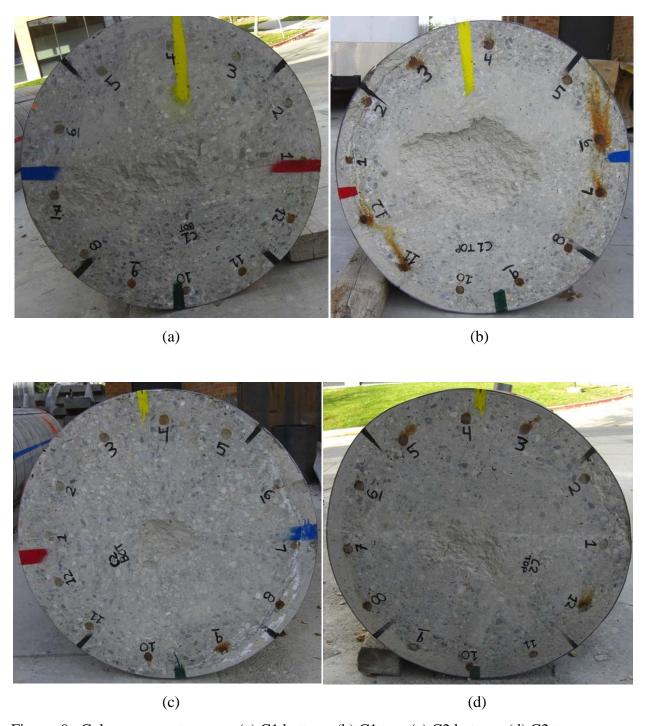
Column concrete cover: (a) C1 bottom, (b) C1 top, (c) C2 bottom, (d) C2 top.
